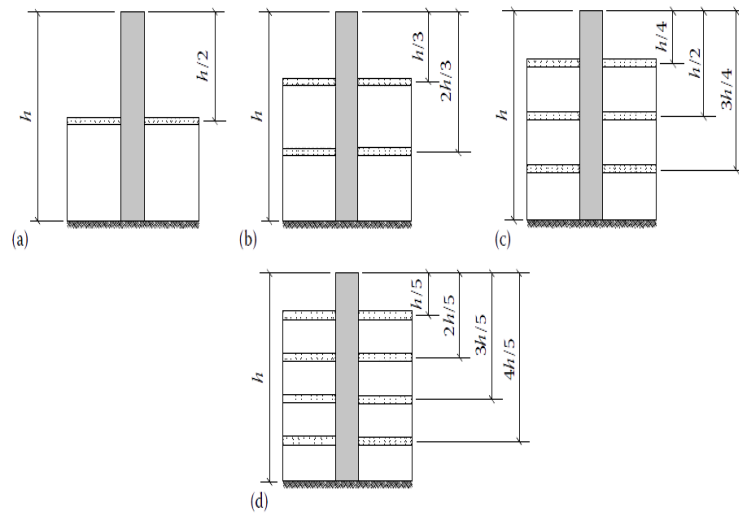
Fig. H. Optimum location of outriggers, (a) single outrigger, (b) two outriggers, (c) three outriggers, and (d) four outriggers.
